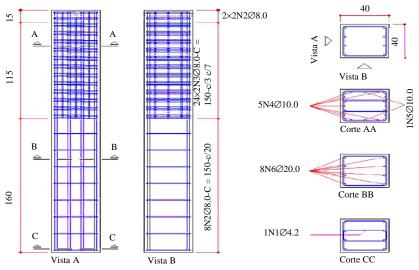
Details of the column in model of PL80 (Ebeling, 2006)
